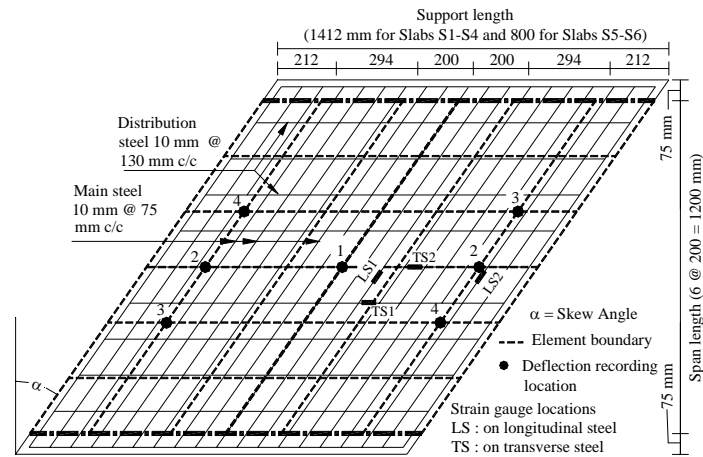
Typical reinforcement layout with deflection recording stations and locations of Strain gauges in Slab S1
